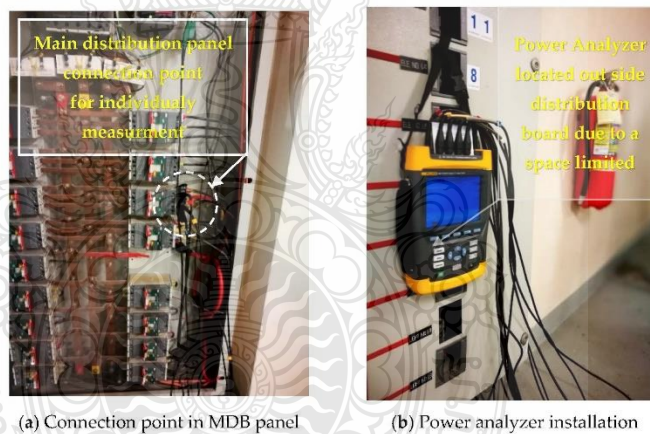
Instrument installation outside the MDB for individual elevator measurement.
